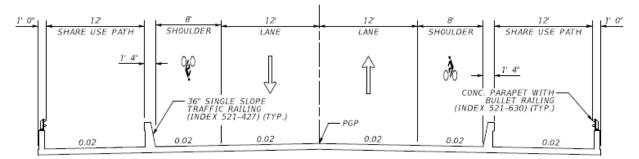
PREFERRED ALTERNATIVE BRIDGE TYPICAL SECTION
